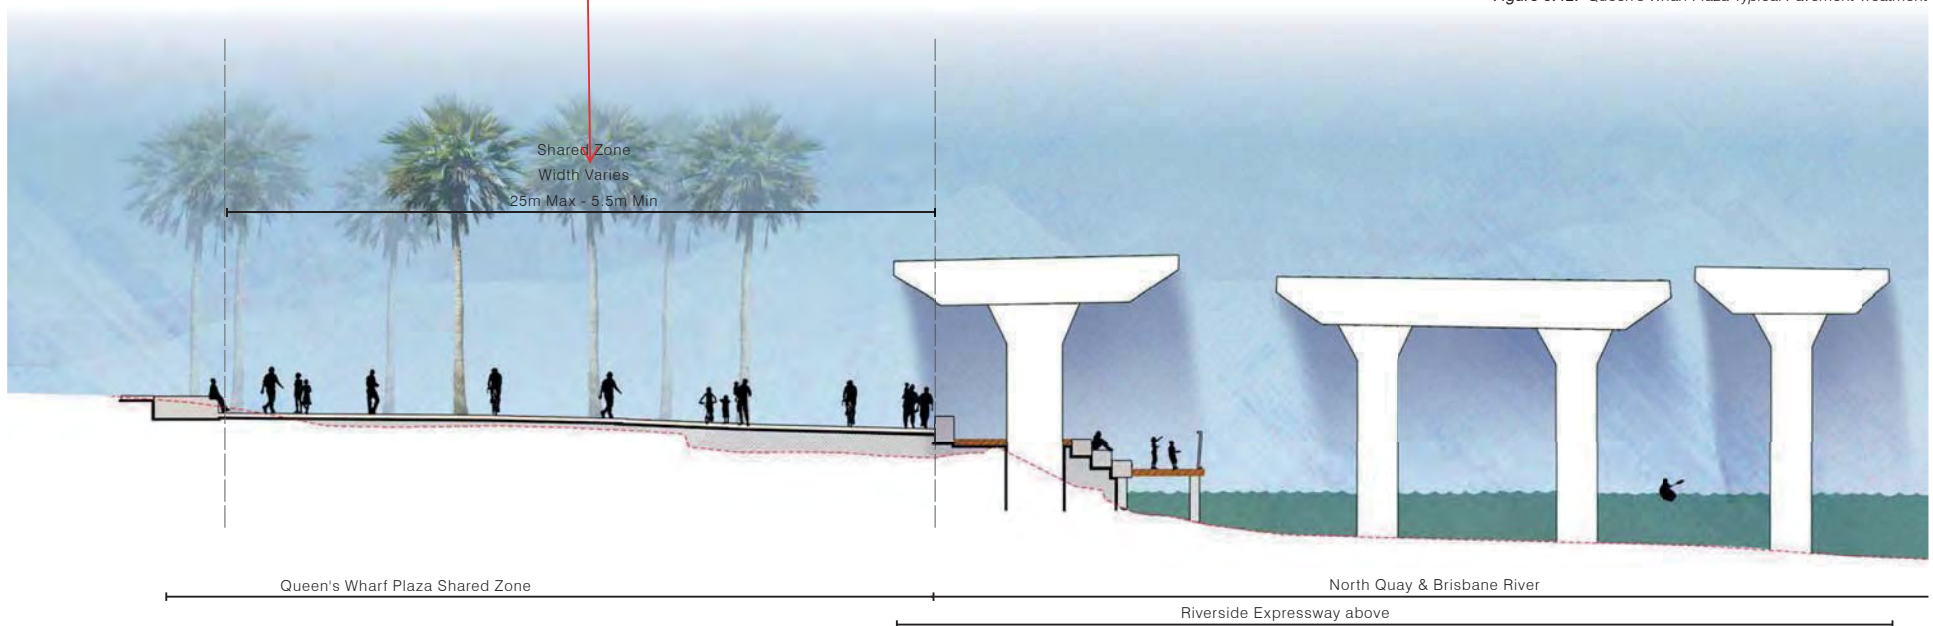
Queen's Wharf Plaza Typical Sectional Elevation (Not to scale)
